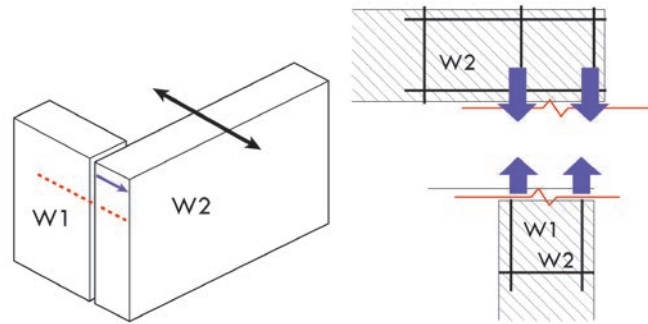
shows a schematic of the mechanism of a typical corner key. When cracks are activated between perpendicular walls, they typically appear on a plane that belongs to the wall perpendicular to the one that tends to overturn outward. Wall W2 is the one that tends to fail, and the vertical crack will develop in wall W1.
